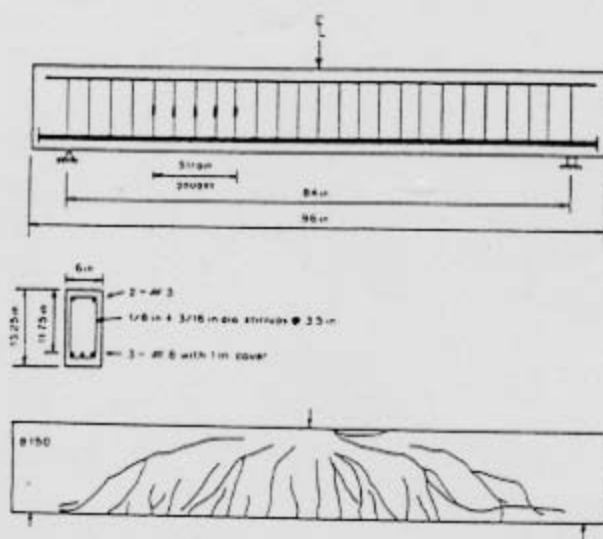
Case study 4. Dimensions and reinforcement detailing and typical crack pattern at experimental failure (after Mphonde et al., 1984)
